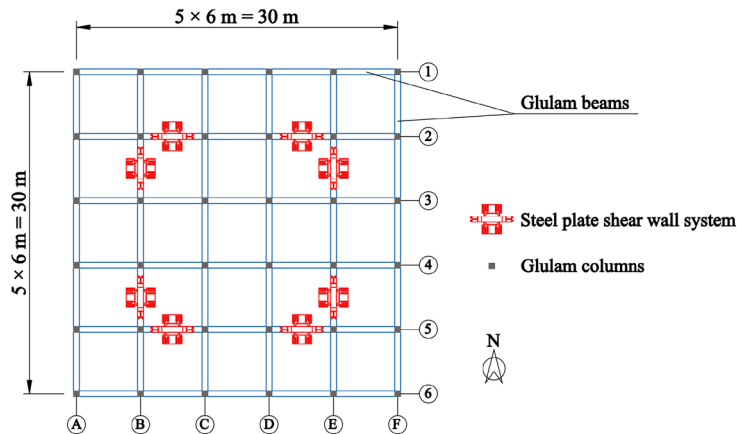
Plan view of the proposed hybrid steel-timber structural system.
